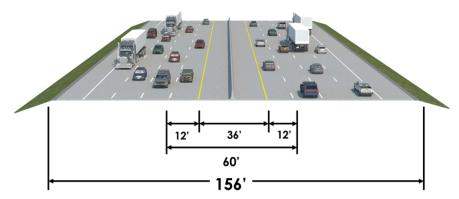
Proposed I-65 8-Lane Widening Typical Section Inside Existing Median
